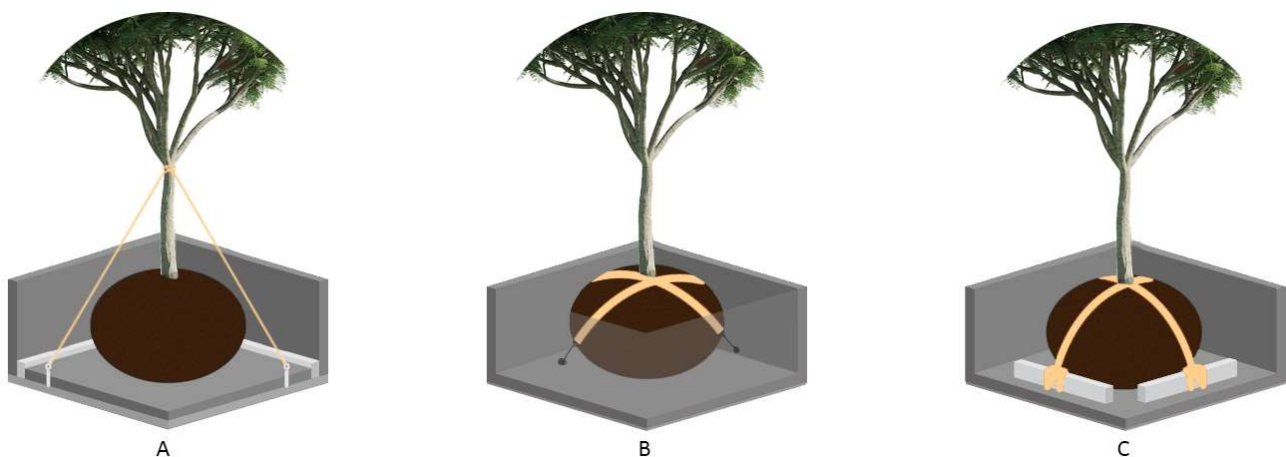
Different anchoring system types, illustrated based on the Melbourne guidelines [21]. (A) = plate anchorage system, (B) = rootball anchorage to planter wall, and (C) = anchor straps and ‘dead man’ system.
